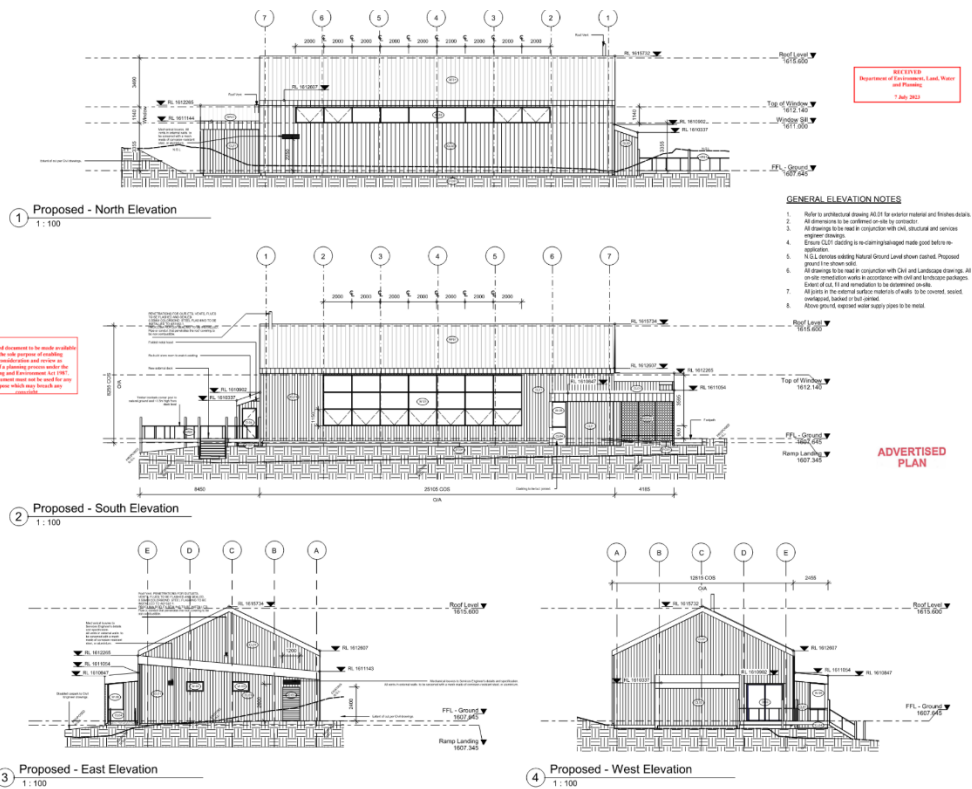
The proposed ANARE shed elevations, extracted from the advertised plans.
